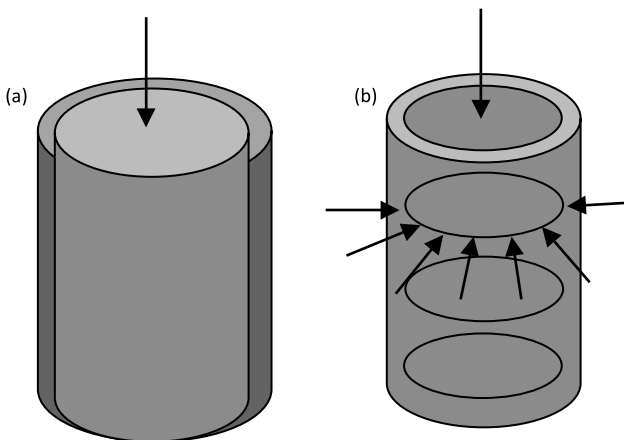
Confinement in FRP-wrapped columns: (a) unconfined column and (b) concrete column confined with wrapped FRP.
